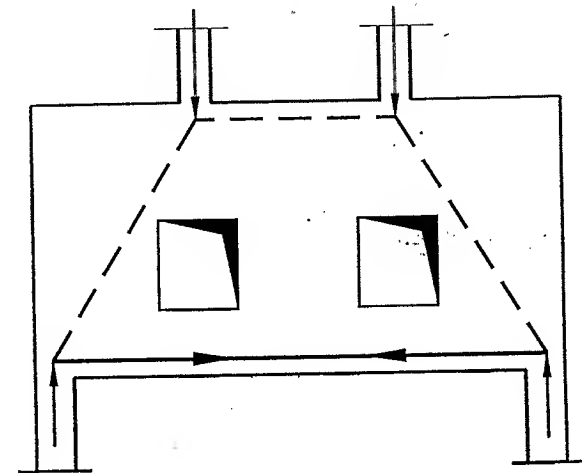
b shows a simply supported deep beam that supports two planted columns and contains two web openings. The locations of the openings interfere with shortest load path between the loads and the supports. Hence, the vertical load of each column has to travel around the opening. Accordingly, a tie has to be located above the openings, together with the traditional one located at the bottom part of the beam.
